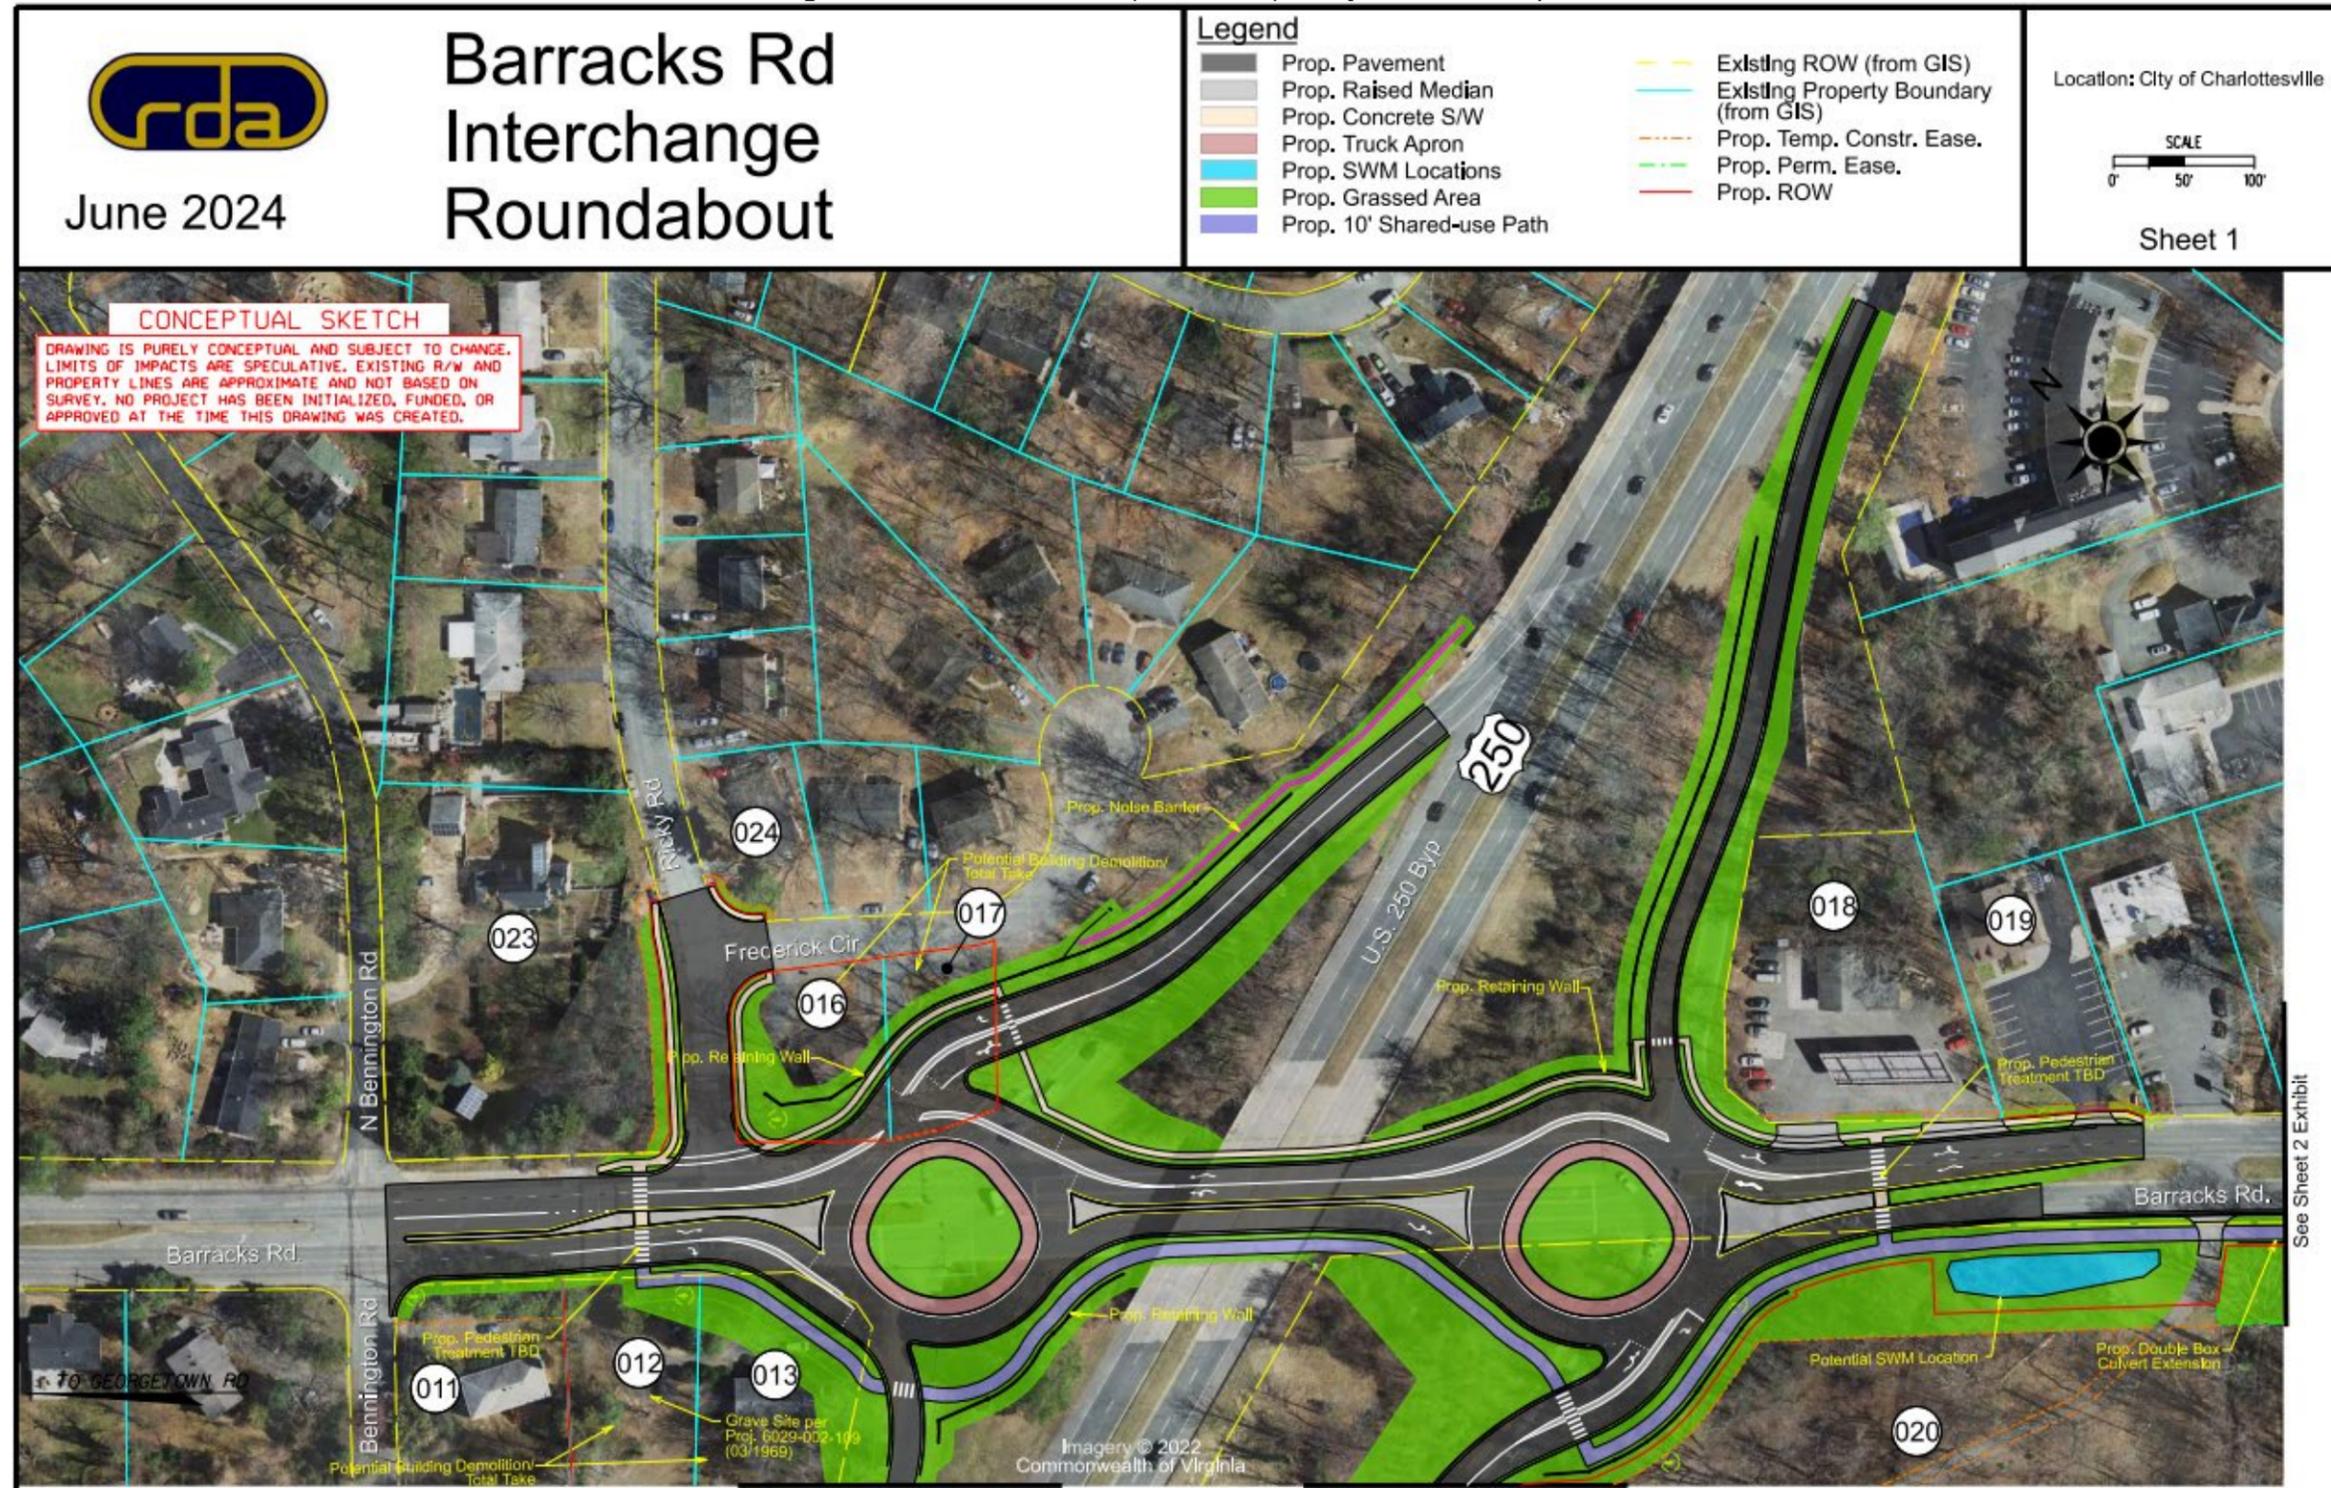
Barracks Road (Route 654) – Layout for Concept 6
